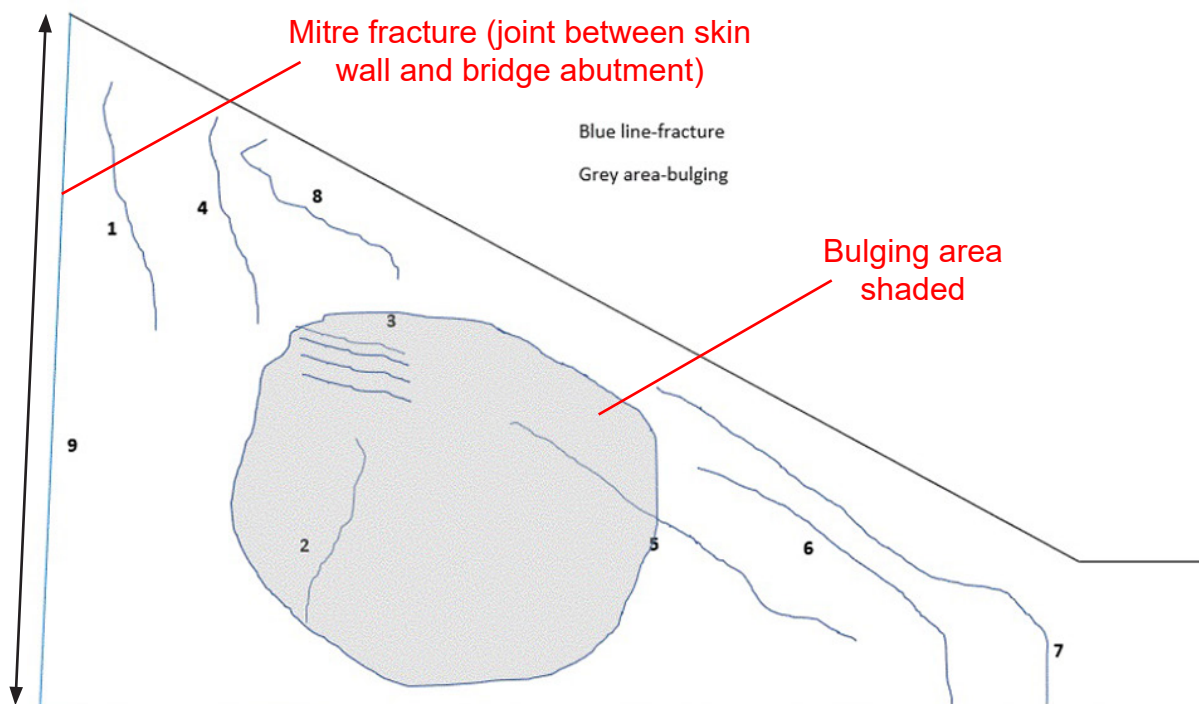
Sketch from 2021 detailed examination report showing defects affecting the south-west wing wall, with RAIB annotations (courtesy of Amey/Network Rail).
